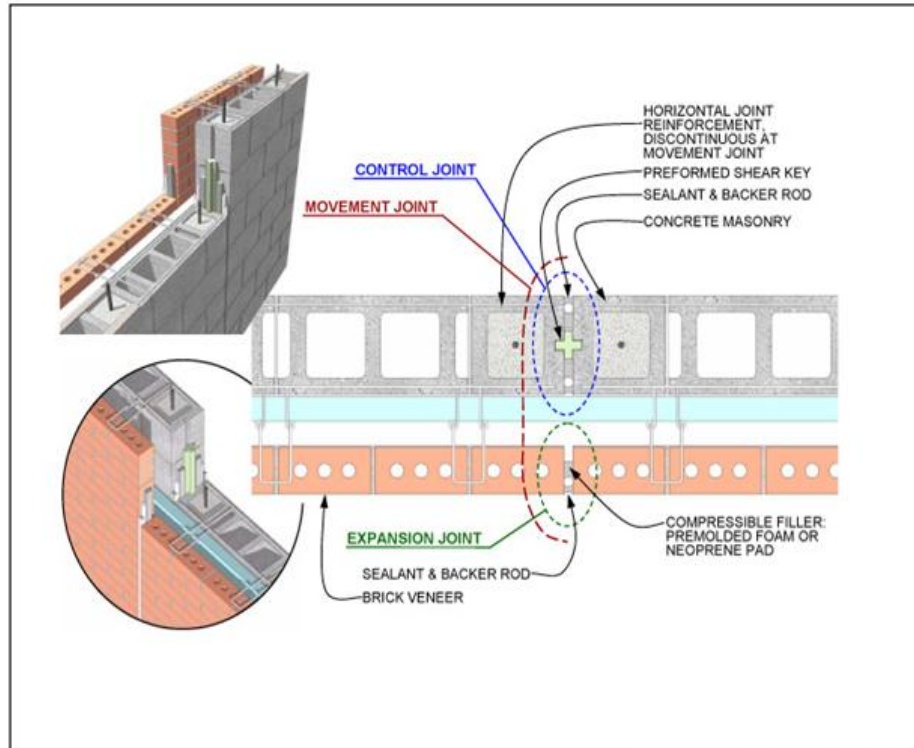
Movement joints in a brick veneer/concrete block wall (IMI, 2008)
